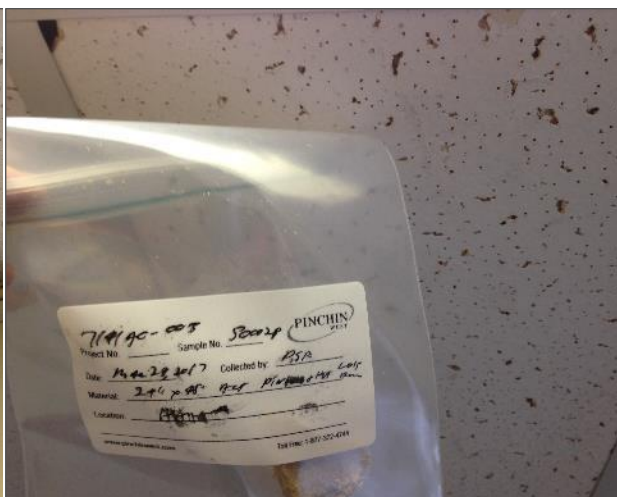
Acoustic Ceiling Tile, 24"x48" Pinhole and Fissure "Pattern less dense" (Sample S0002A-C) Hallway Location (117).
